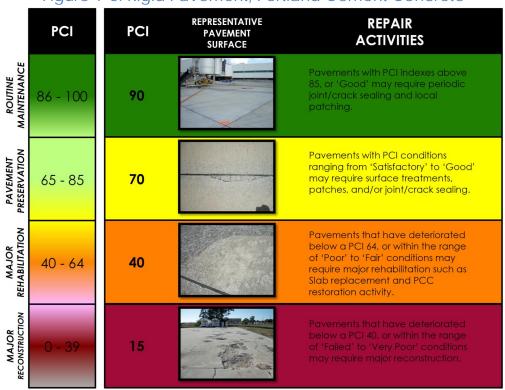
Rigid Pavement, Portland Cement Concrete
